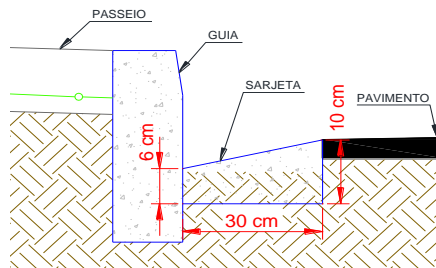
Transversal Section of Gutter. Source: Own Author.
